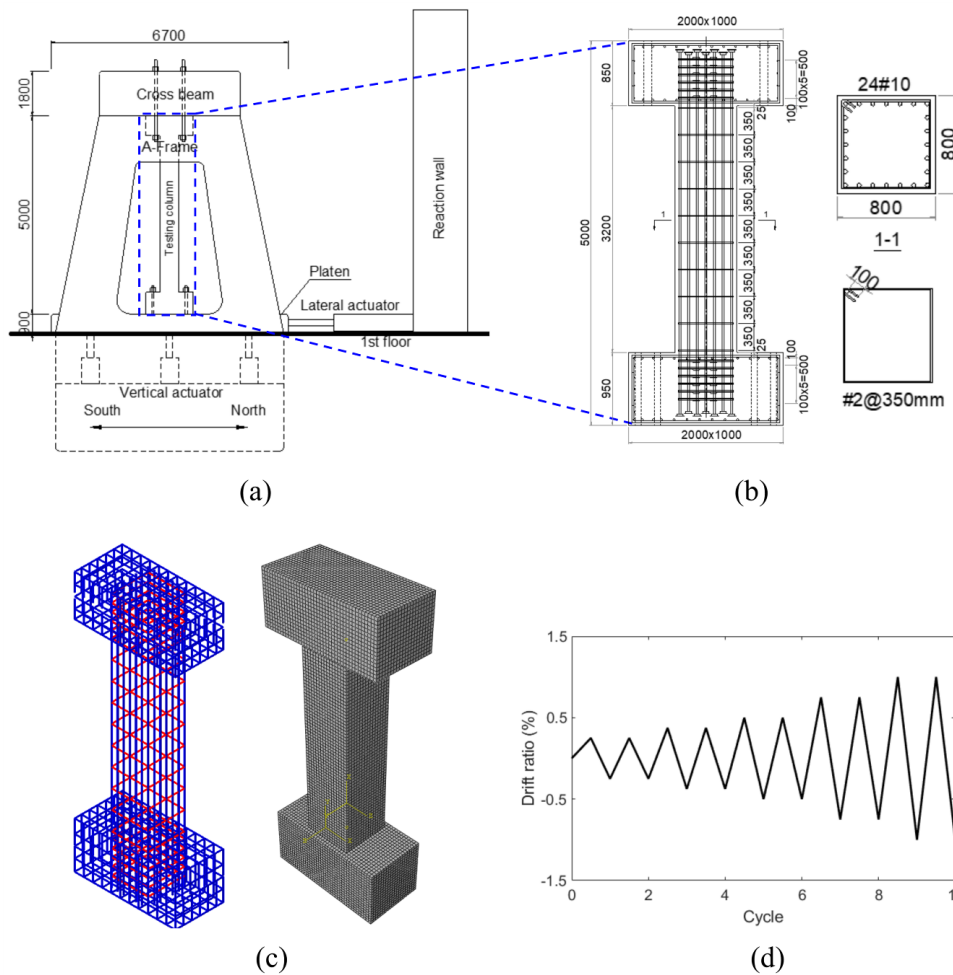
Full-scale shear-critical RC column test: (a) test set-up; (b) specimen dimensions and reinforcement details; (c) finite element model; (d) loading protocol.
